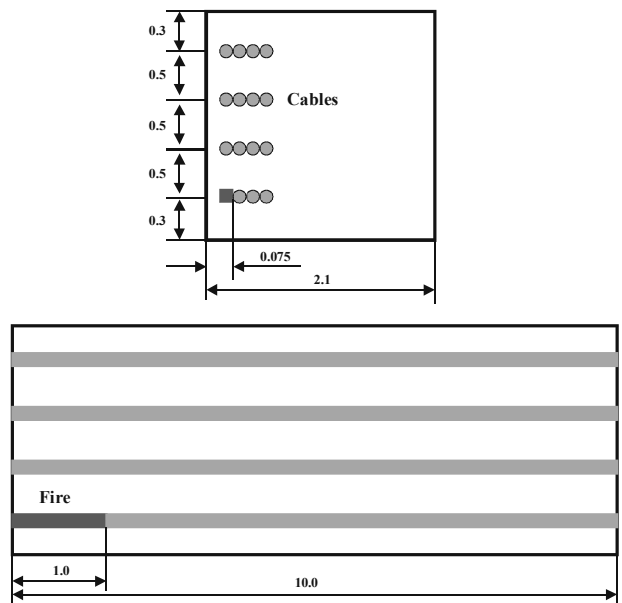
Schematic diagram of the utility tunnel systems (unit: m) (top: cross-sectional views of utility tunnel; bottom: longitudinal cross-section).
